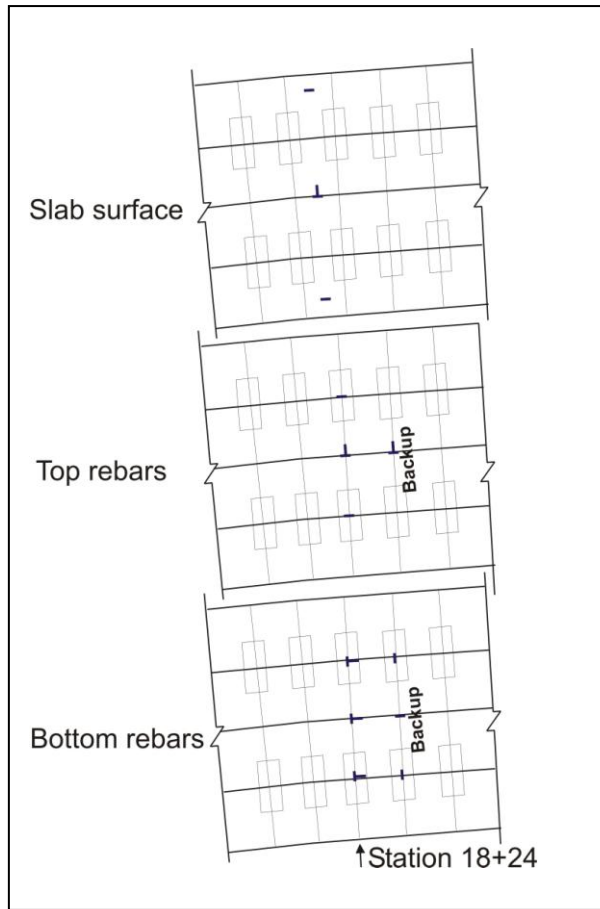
Arrangement of Strain Gages on Slab Surface and Reinforcement Bars
